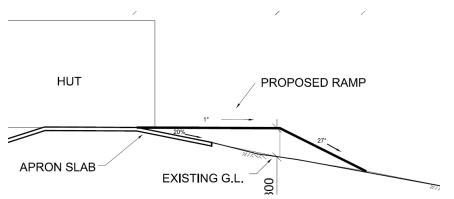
Extract of the Long section of the prefabricated temporary ramp
